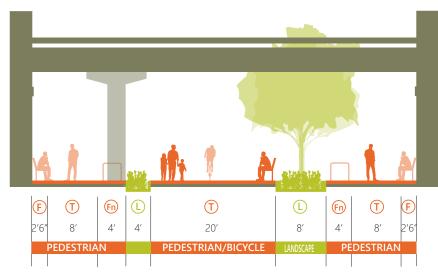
Campus street conversion, Montgomery between Broadway and Park Avenues.
